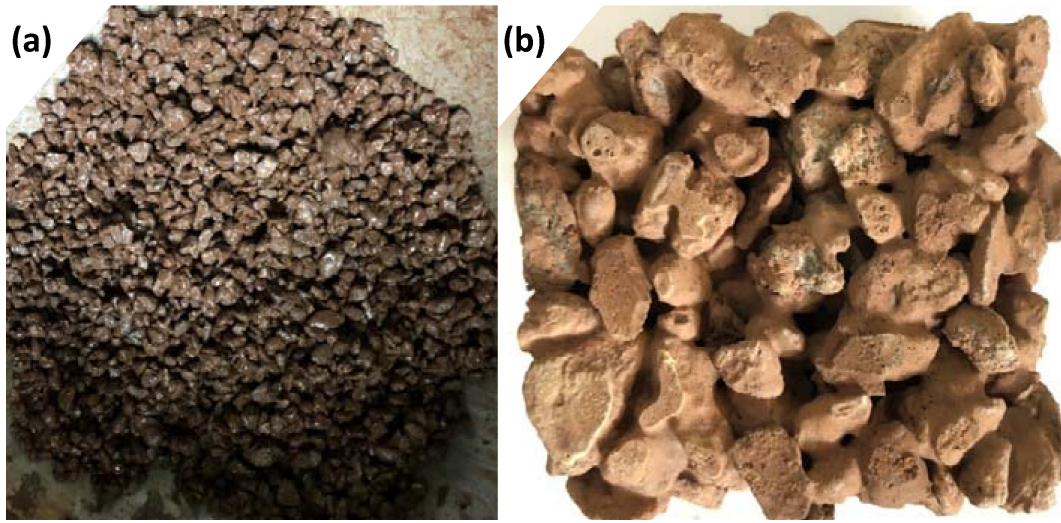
(a) In-situ mixing of pervious concrete, and (b) the hardened cubic specimens.
